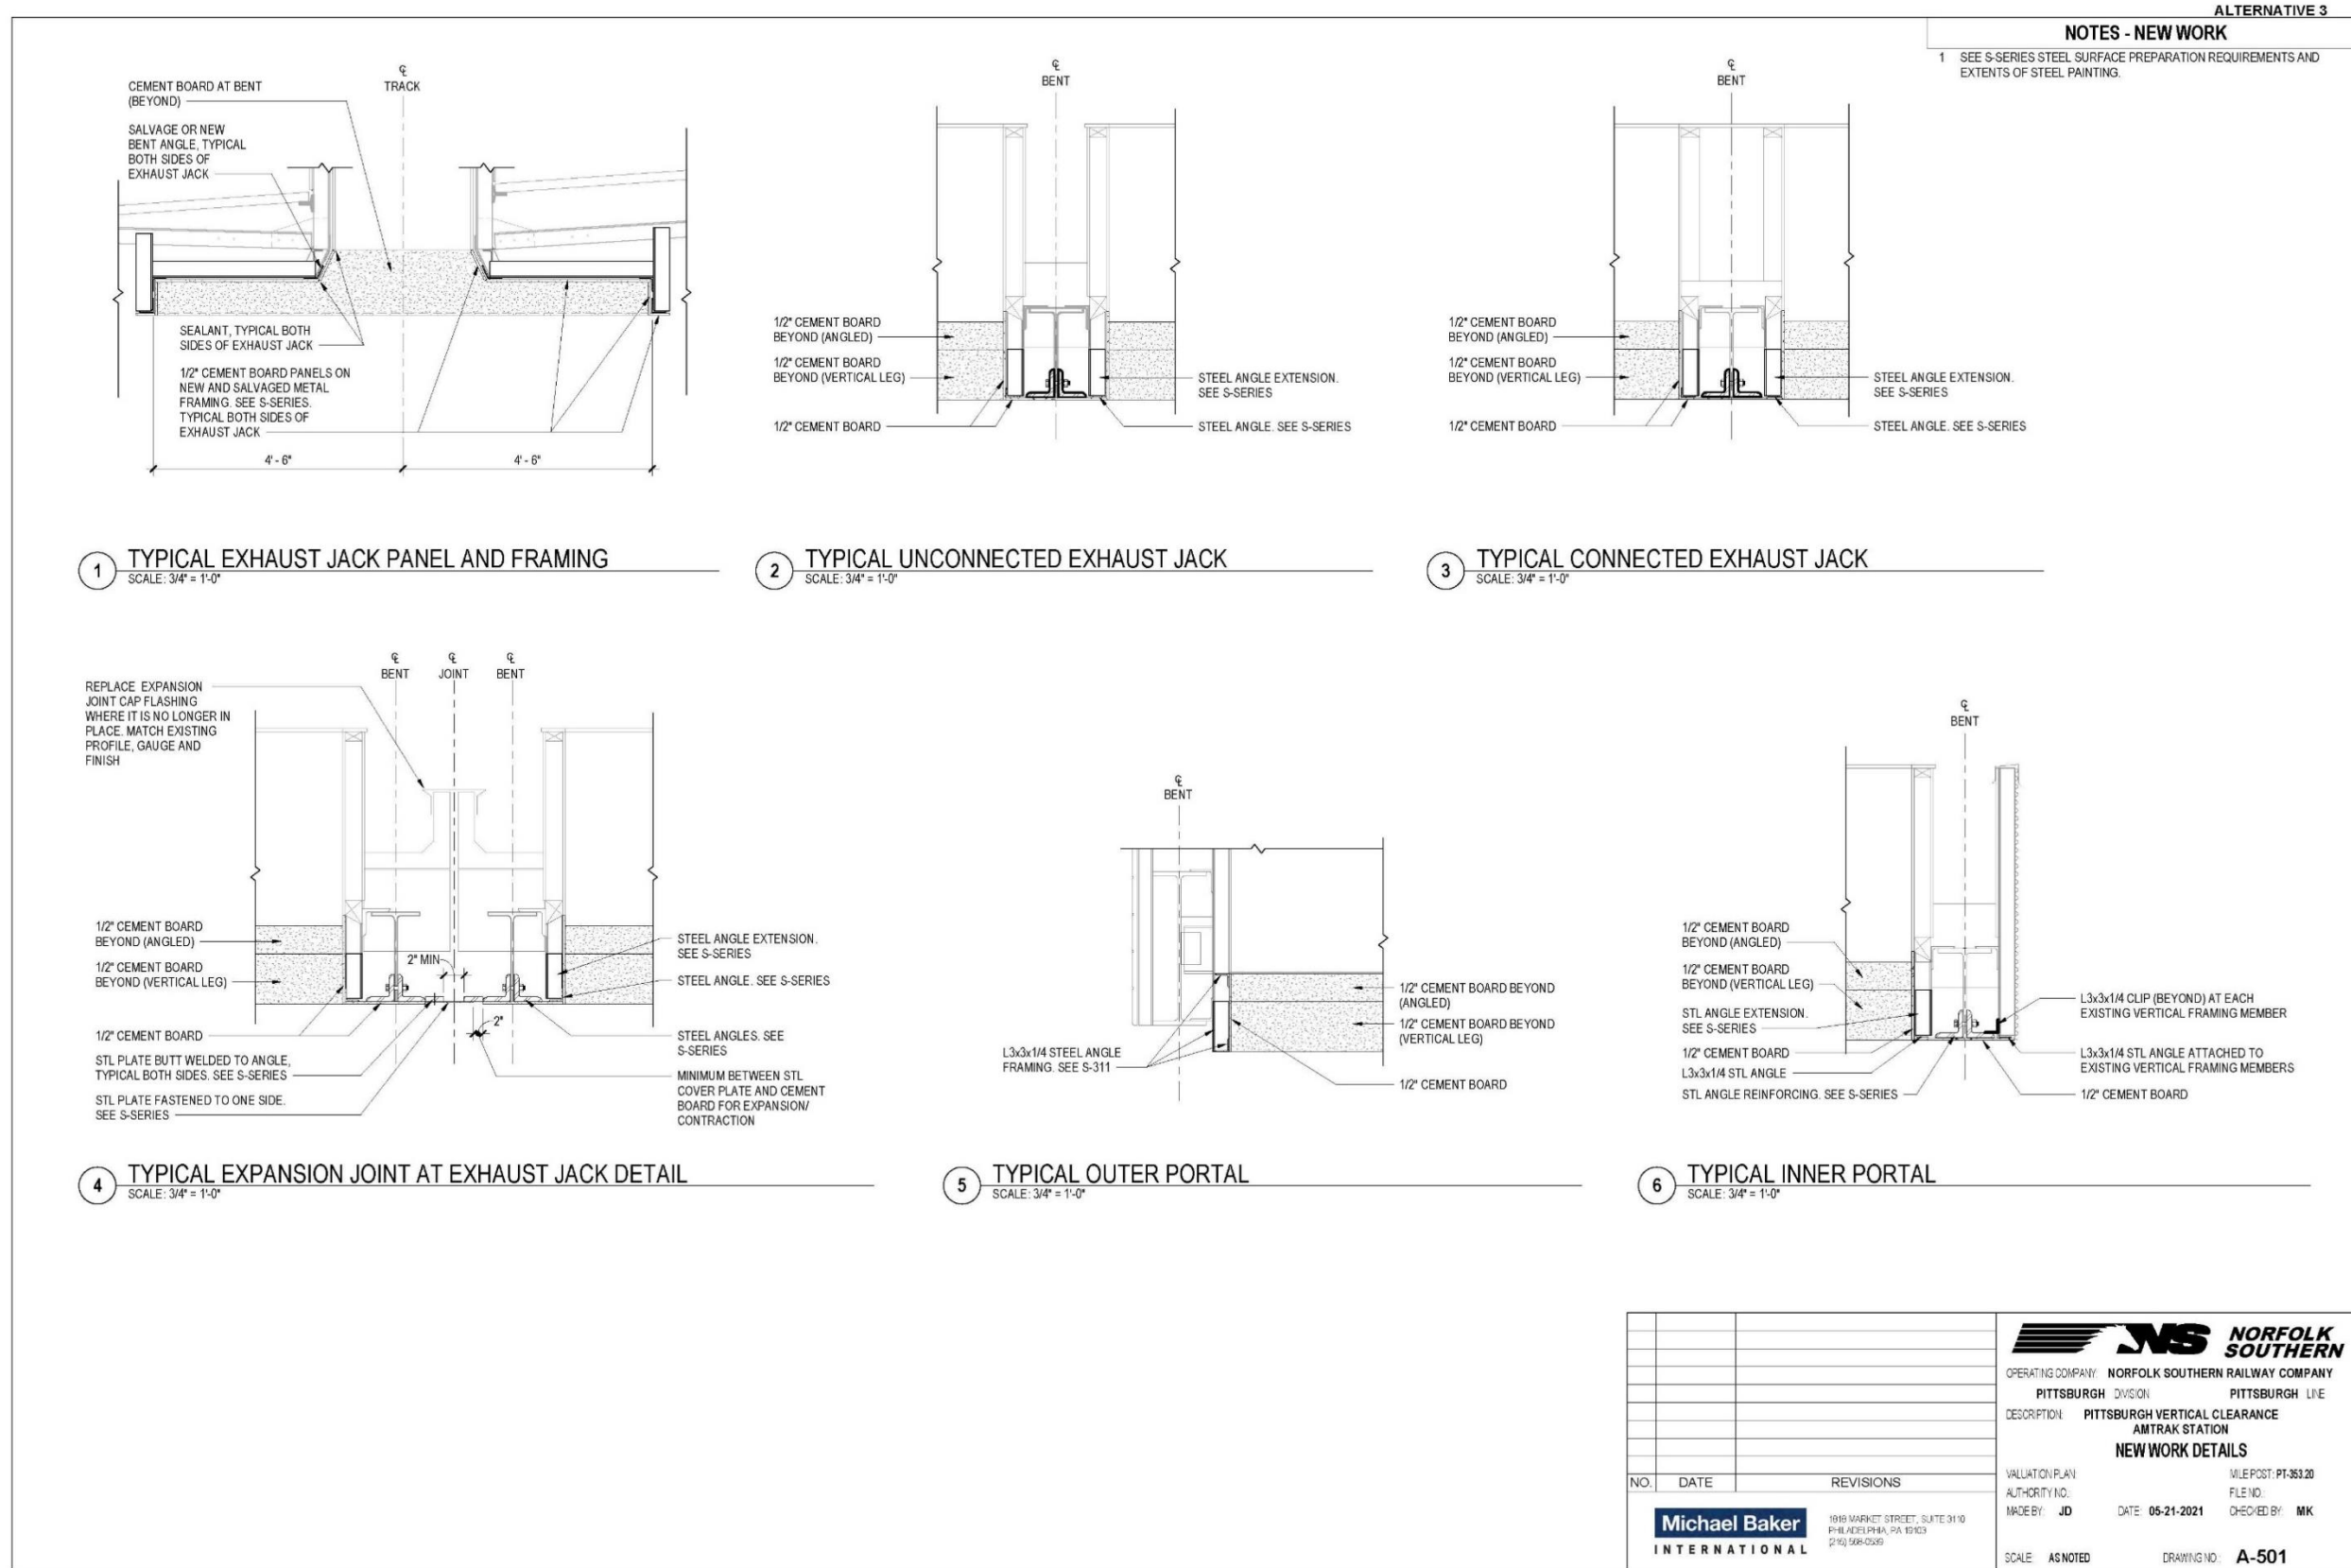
Plan sheet showing modifications to exhaust jack.
